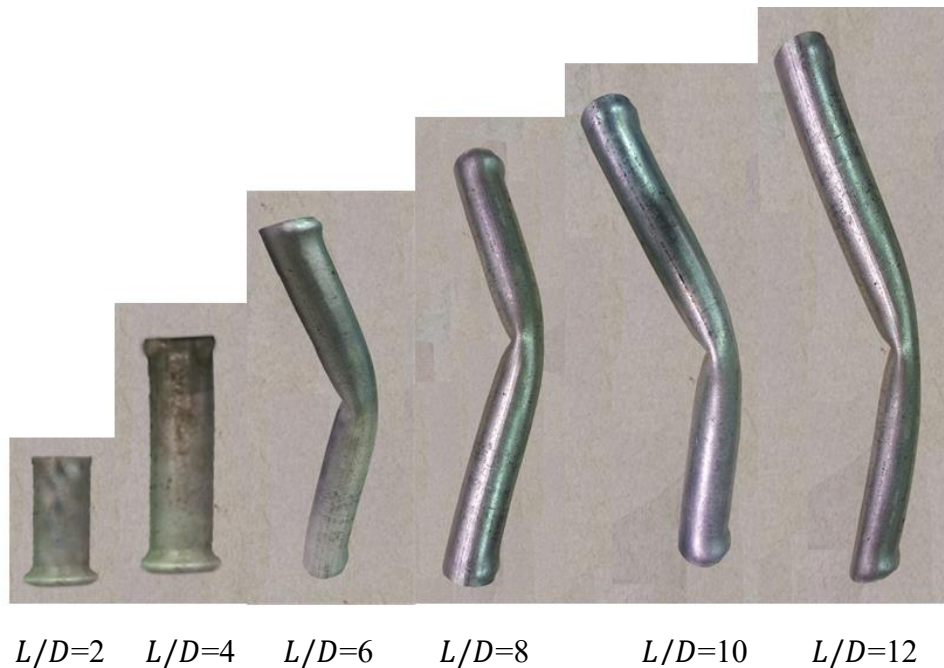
Typical failure modes of galvanized steel tube specimens
